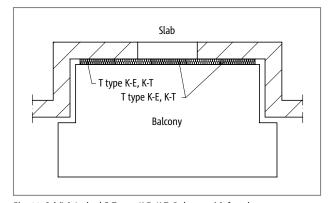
Schöck Isokorb® T type K-E, K-T: Balcony with façade recess
